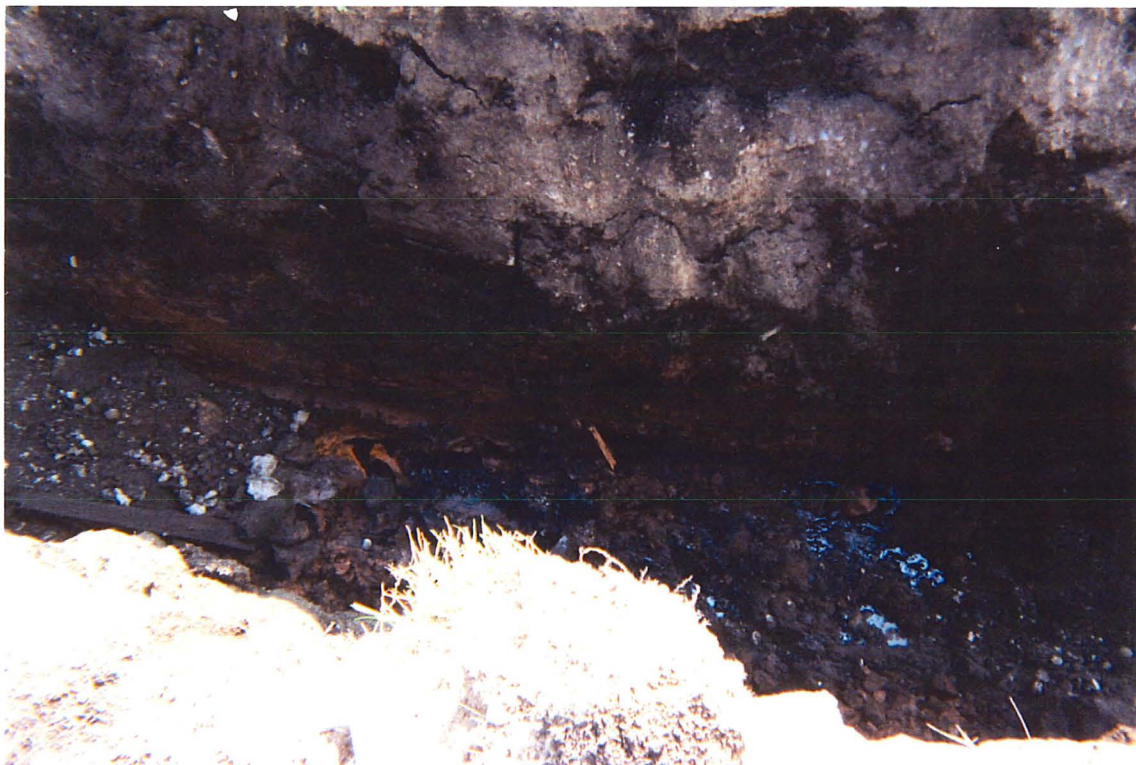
View of excavation with the clay pipe visible at the bottom of the trench.
